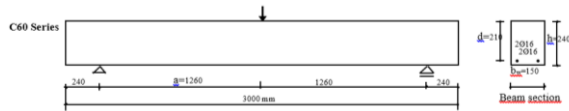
Geometry and Reinforcement Arrangement of Beams
